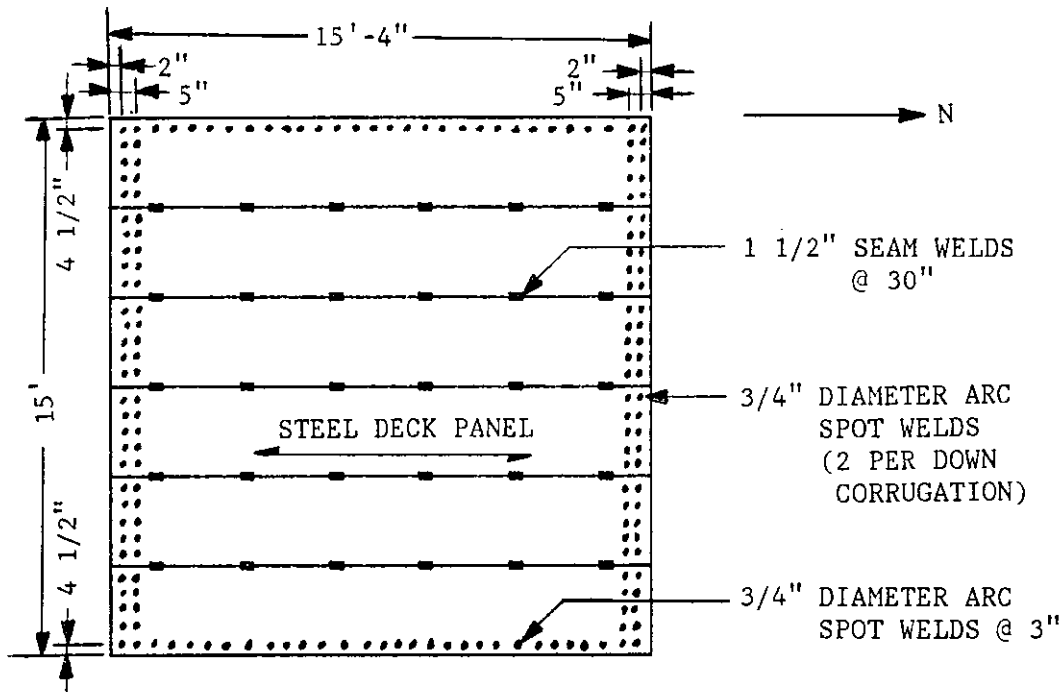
Plan view of edge connector layout for Slabs 6 and 17
